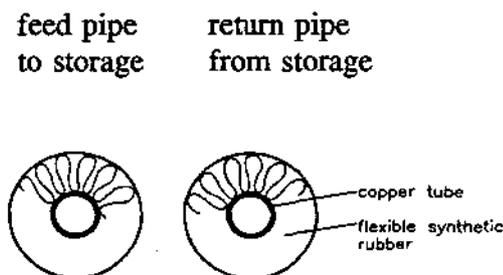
Cross Section of the Typical Fixed Tubing.
